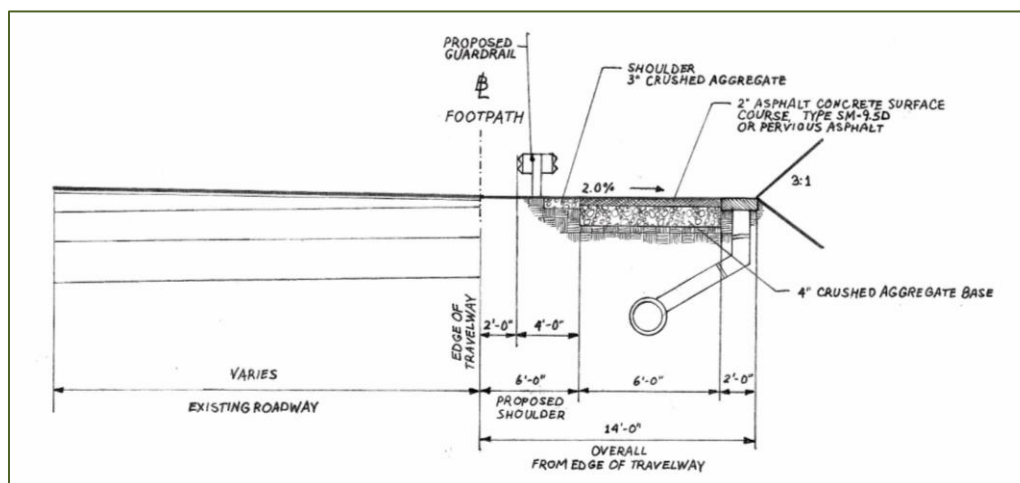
Possible Typical Section for Footpath with Inlet and Drainage System
